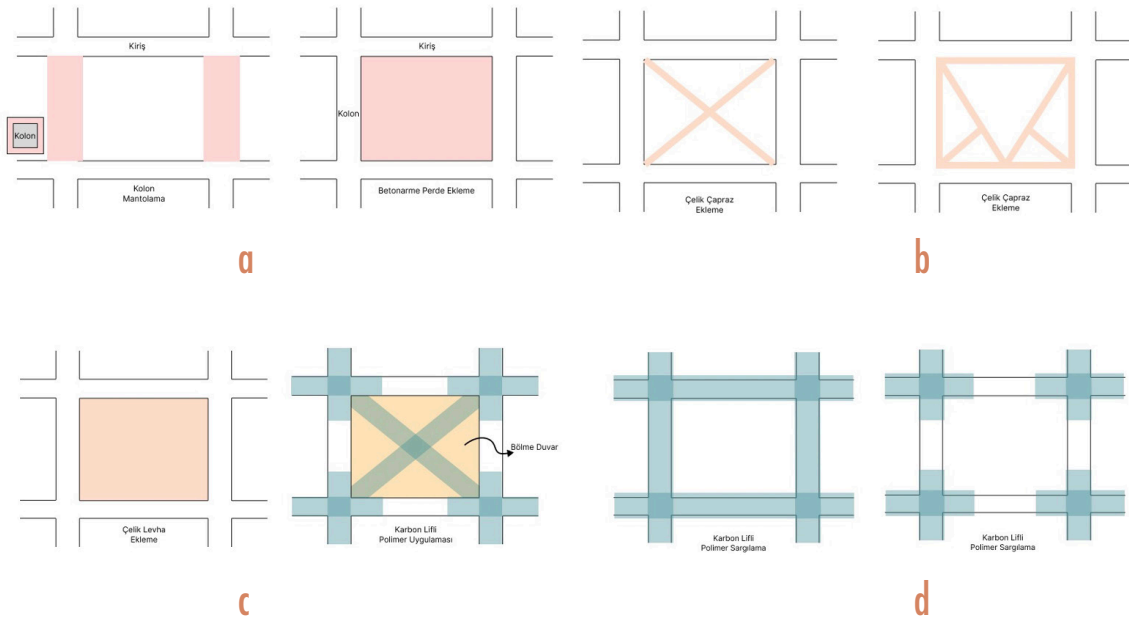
Potential retrofit schemes for framed buildings a)Column jacketing and adding RC shear wall b)Adding steel bracing of any configuration c)Adding thin steel plate shear wall and using infill wall as part of retrofit together with G/CFRP sheets d)Wrapping frame elements with G/CFRP(complete and partial wrapping around beam-to-column regions).
